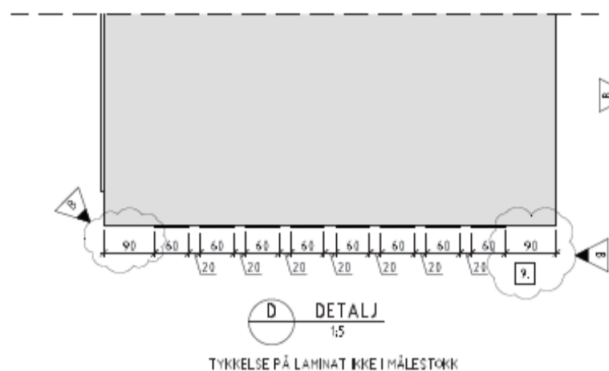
Details of CFRP reinforcement at cross section of beam [34]
